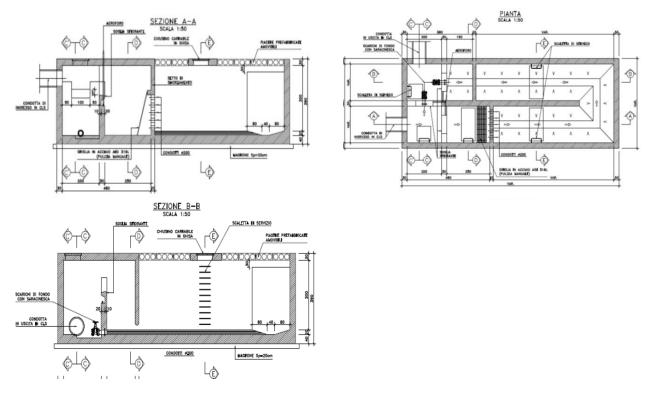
Technical drawing showing the section (left) and plan (right) of a concrete treatment tank used in Italy
